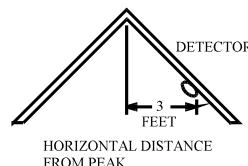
Recommended installation location for smoke / heat detectors in rooms with sloped ceilings or gables (slope >20 degrees).
